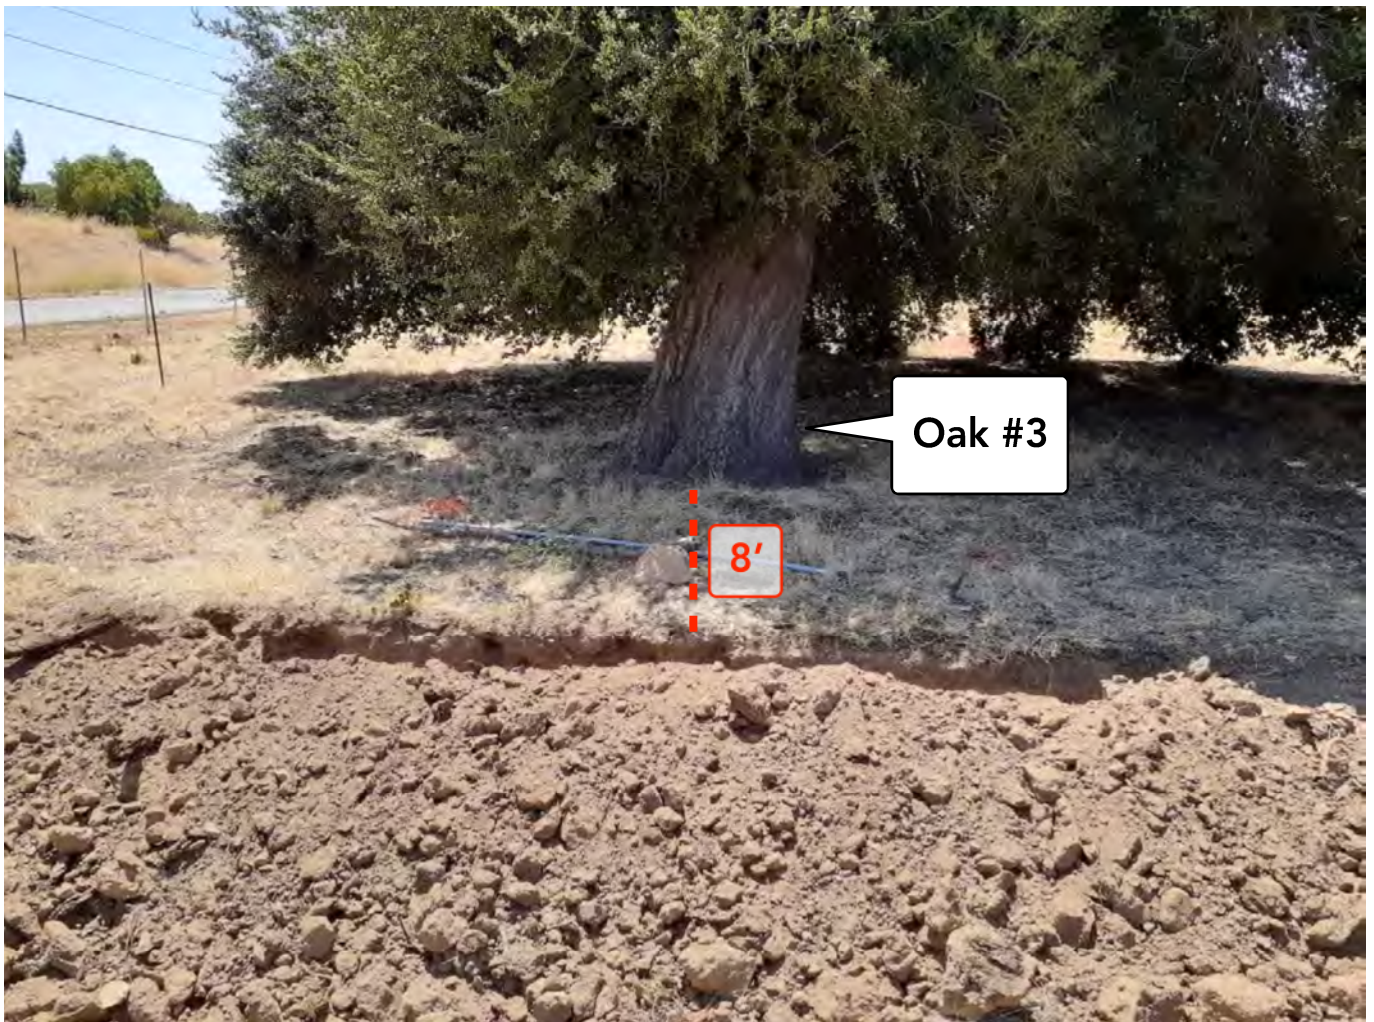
Shows a frontal view of trenching in front of oak #3.
